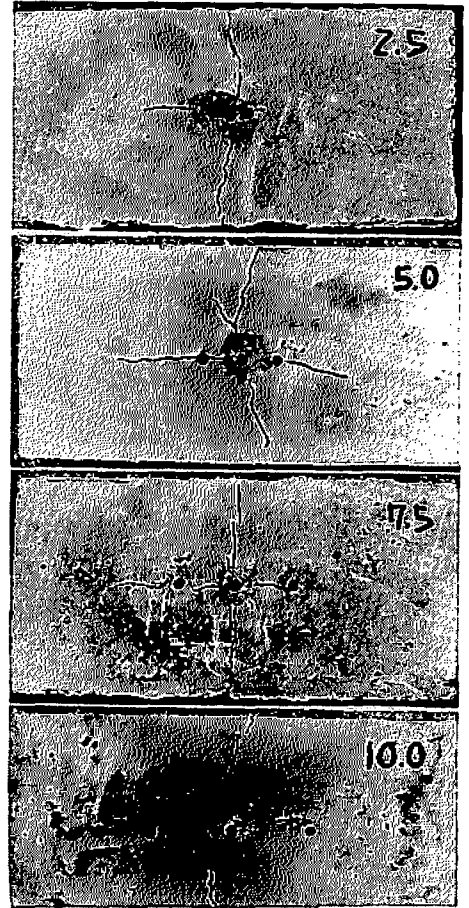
Crack patterns from blast hole with guide holes (Concrete specimen)
